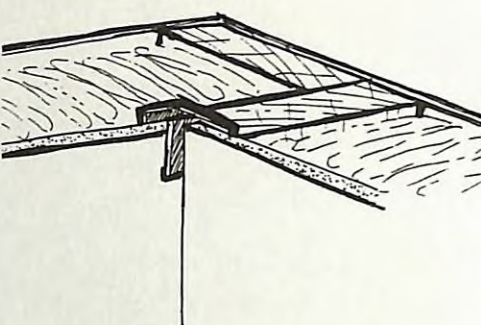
On corners use a two stud framing detail and attach second drywall sheet with drywall clips to allow the drywall to float. This allows the drywall to float, so that stresses can't pull apart the drywall and cause cracking of the filler.
